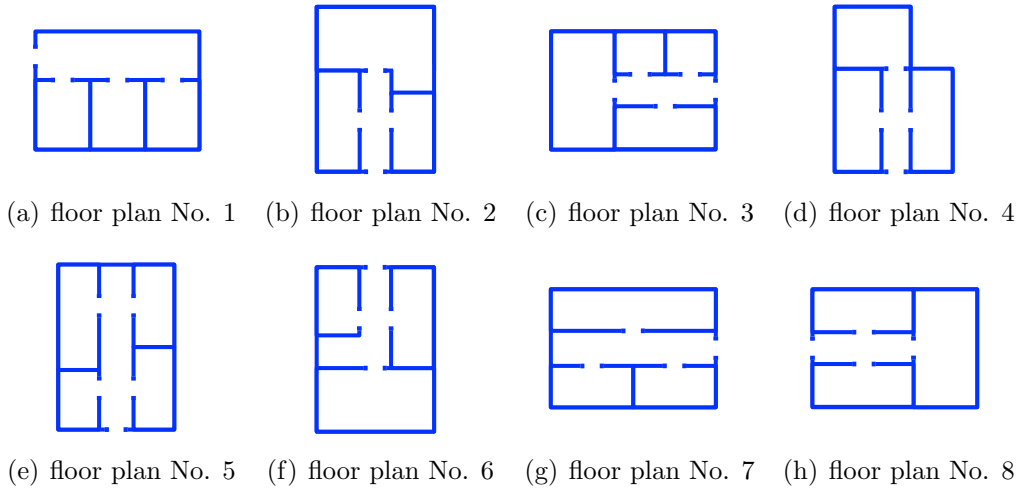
Floor plan stimuli employed in the experiment section of sketch collection study
